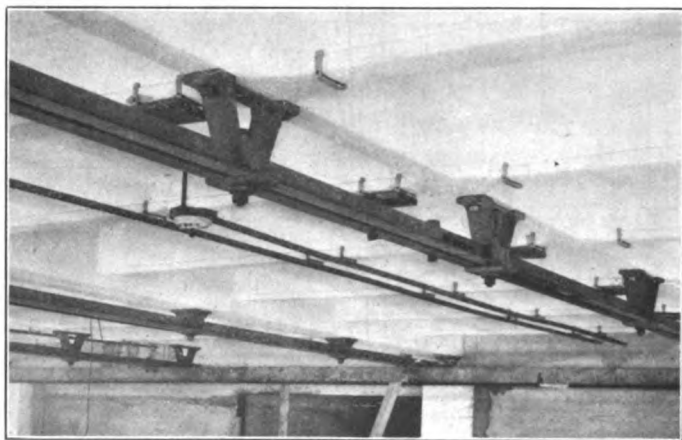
DEVICE FOR SUPPORTING LIGHT FIXTURES
